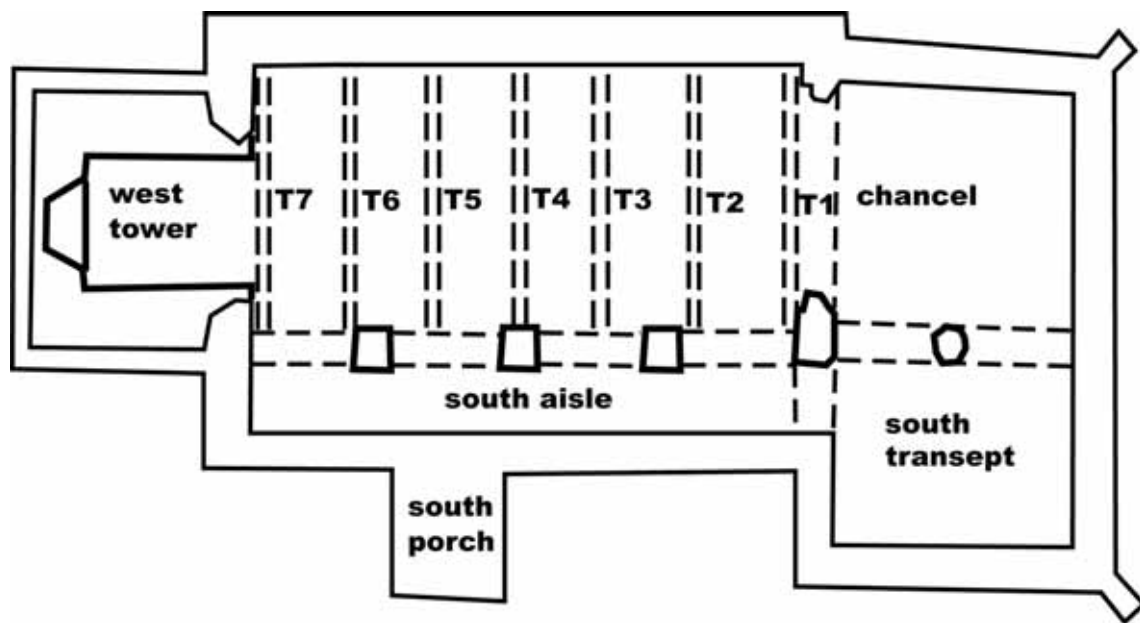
St Mary's Church, ground-floor plan, showing the truss positions in the nave (after RCHME)
